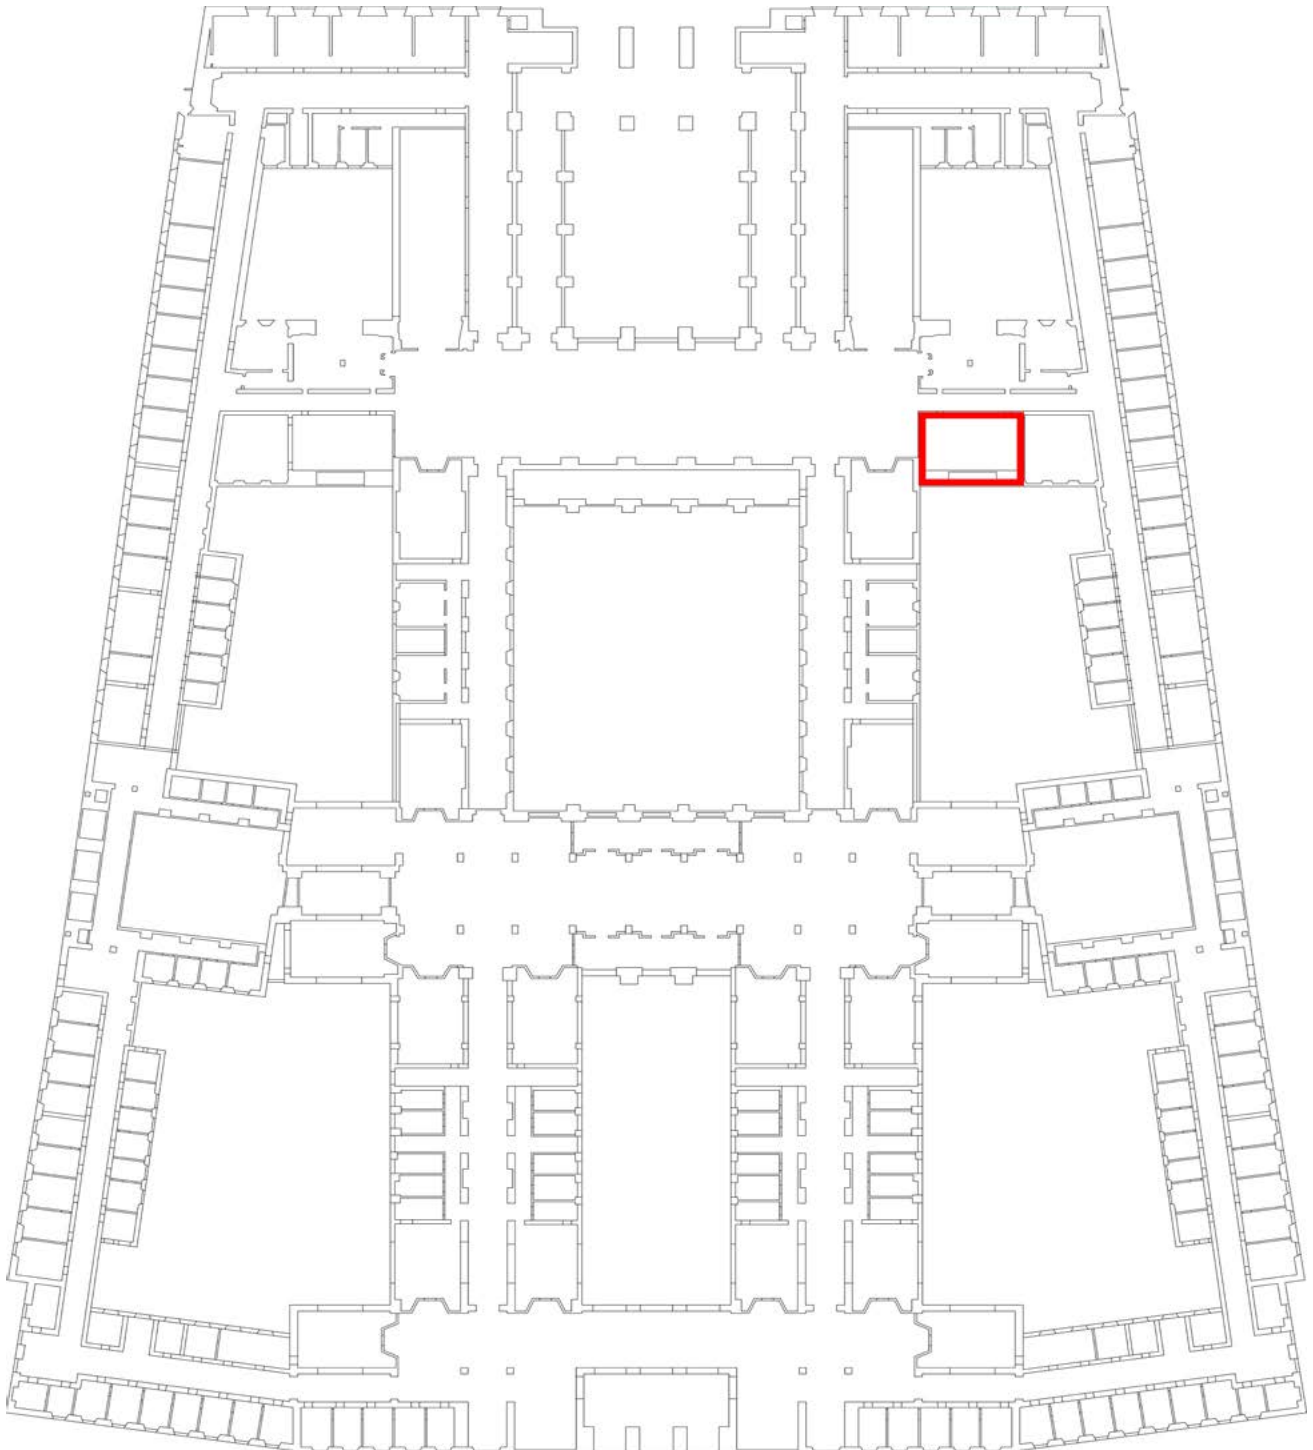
Location of the Stefanini Room - Third floor plan of the courthouse.
